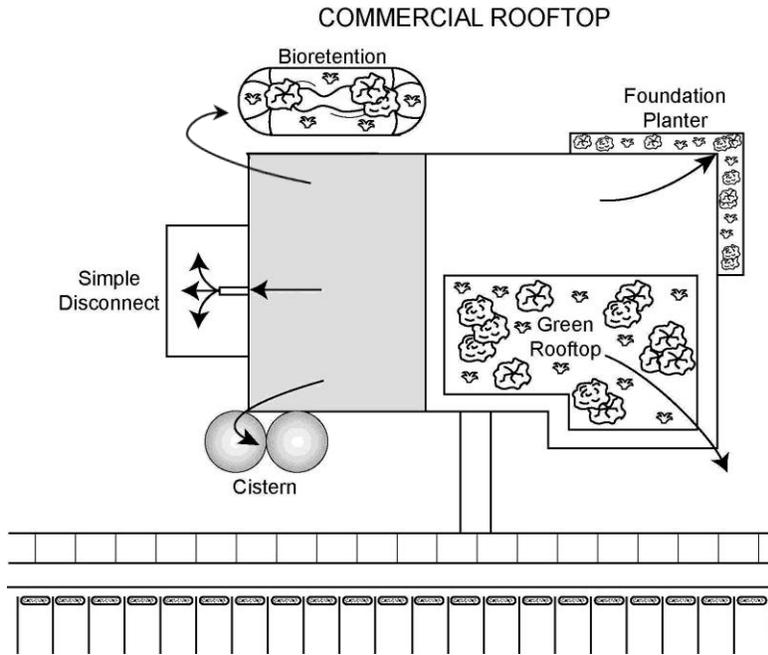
Roof Disconnection with Alternative Runoff Reduction Practices (Source: VADCR, 2011)
